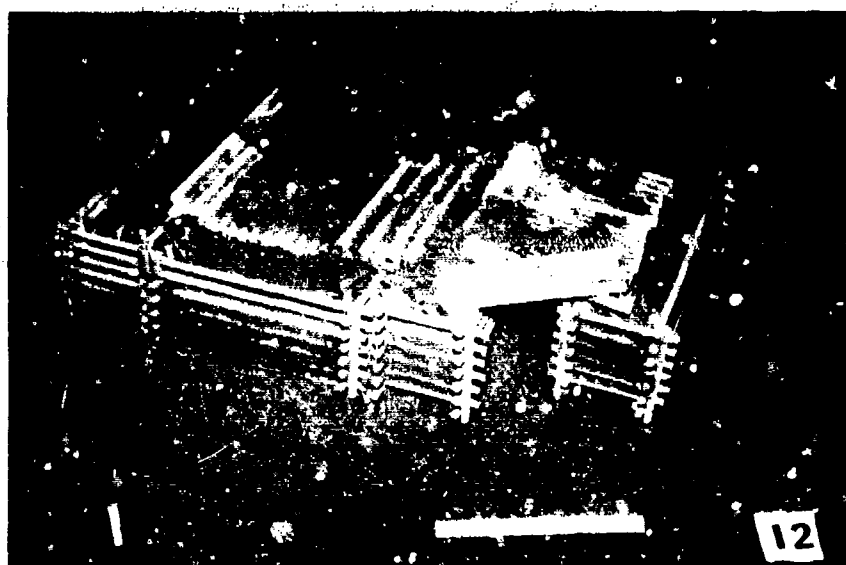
Modified Crib-Walled Shelter After High Pressure Test
